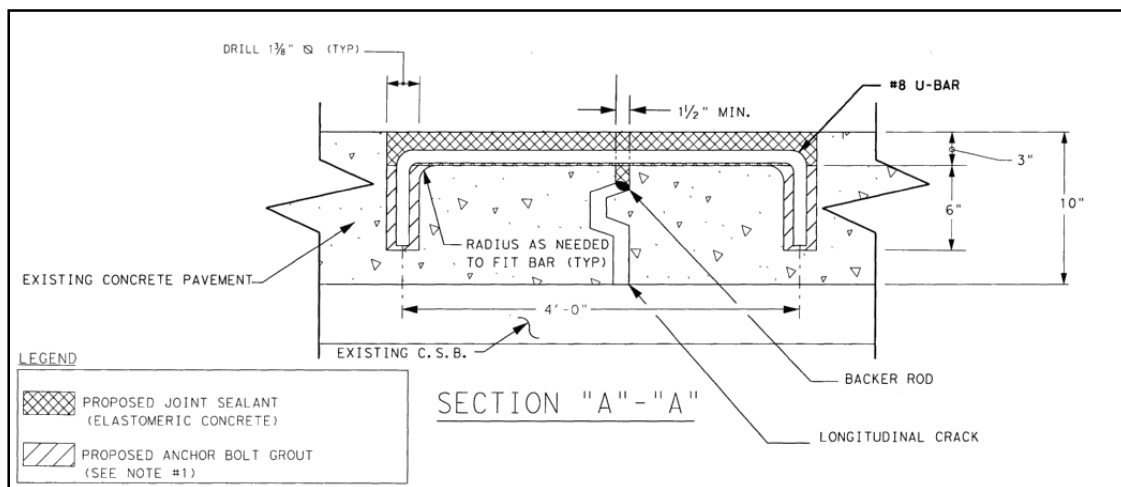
Elevation View of Stapling Repair (TxDOT 2004c)
